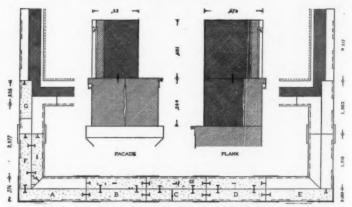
PLAN AND SECTIONS OF EPISTYLE.
